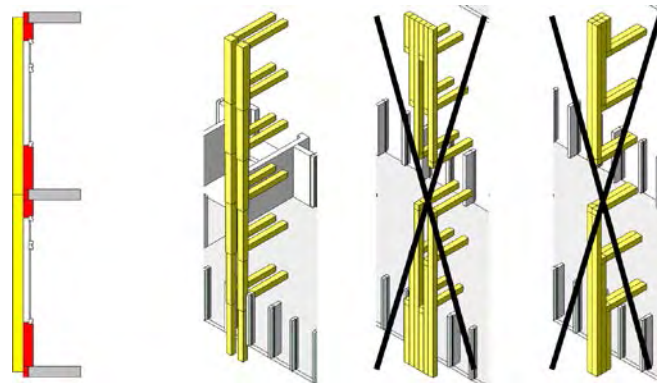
left: façade intersection with additionally mounted modules, right: discussed ventilation ductwork inside the façade elements
